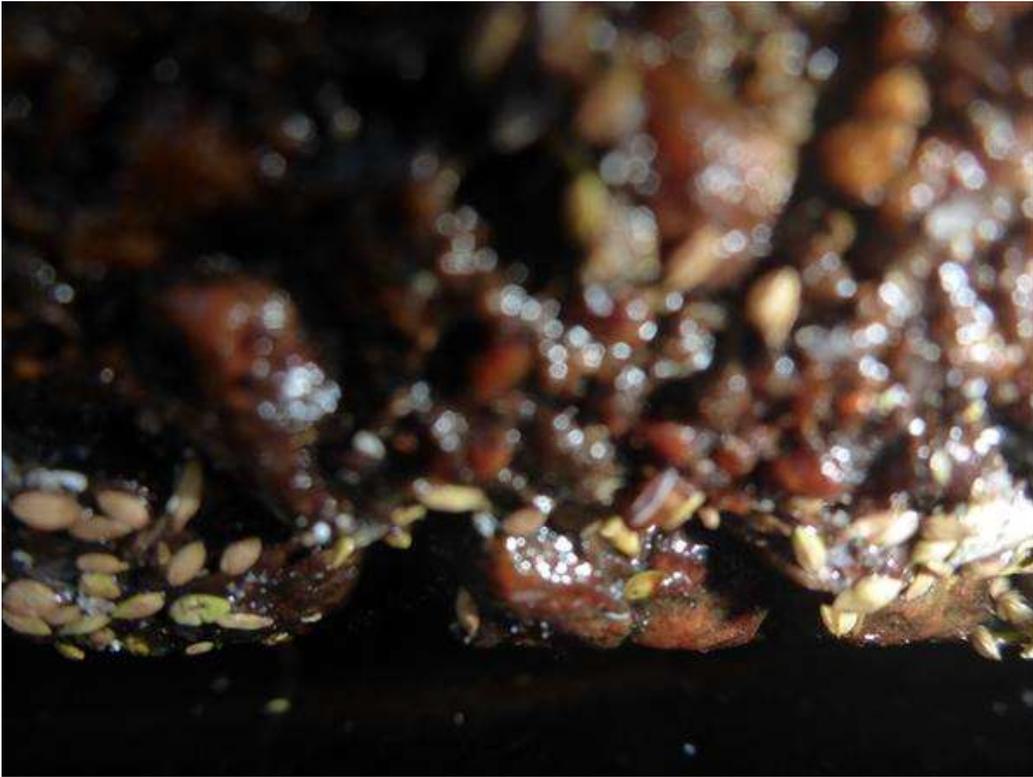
Typical Concrete Condition at Waterline, Looking North
